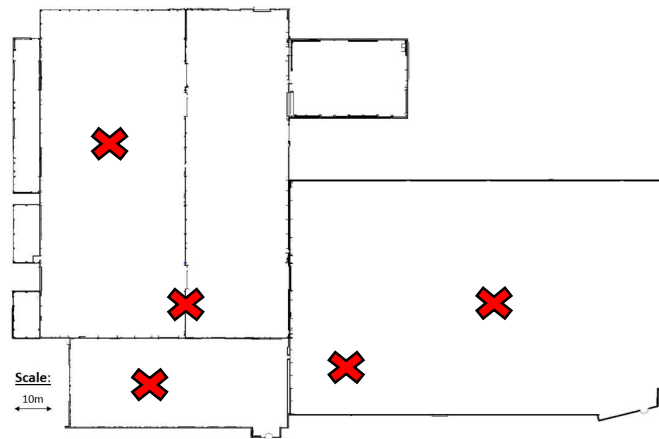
Floor Plan of the Workshop Area at NCC Emersons Green, Bristol
